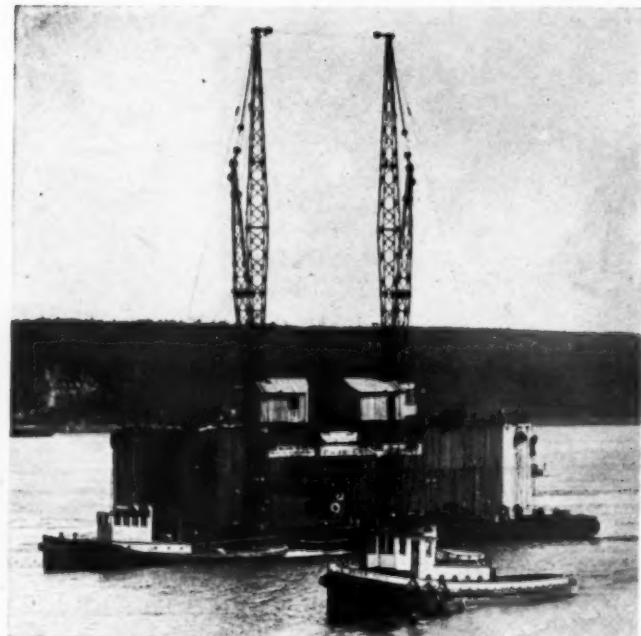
Caisson for Pier 4 Being Towed to Position, Like a Boat or Barge.
